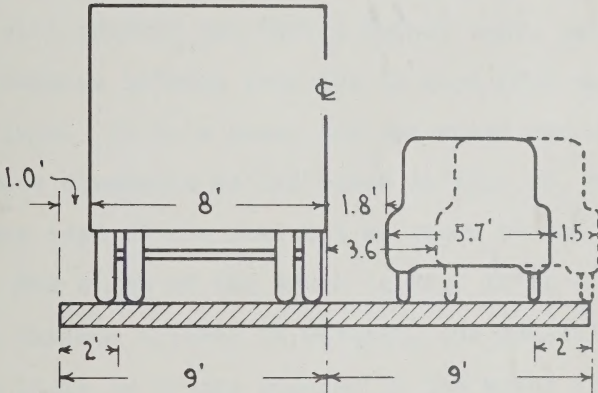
Truck and Passenger Car Passing on an 18 Foot Pavement
